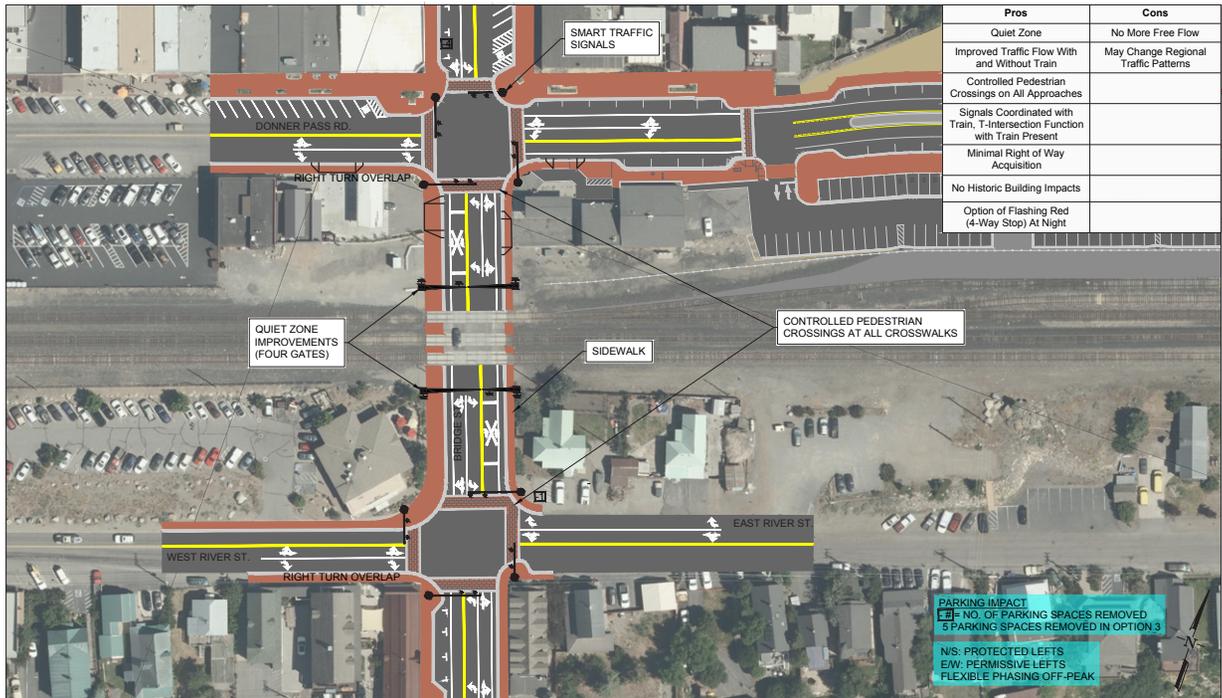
Bridge Street Improvements, Option 3 Concept (Traffic Signals)
